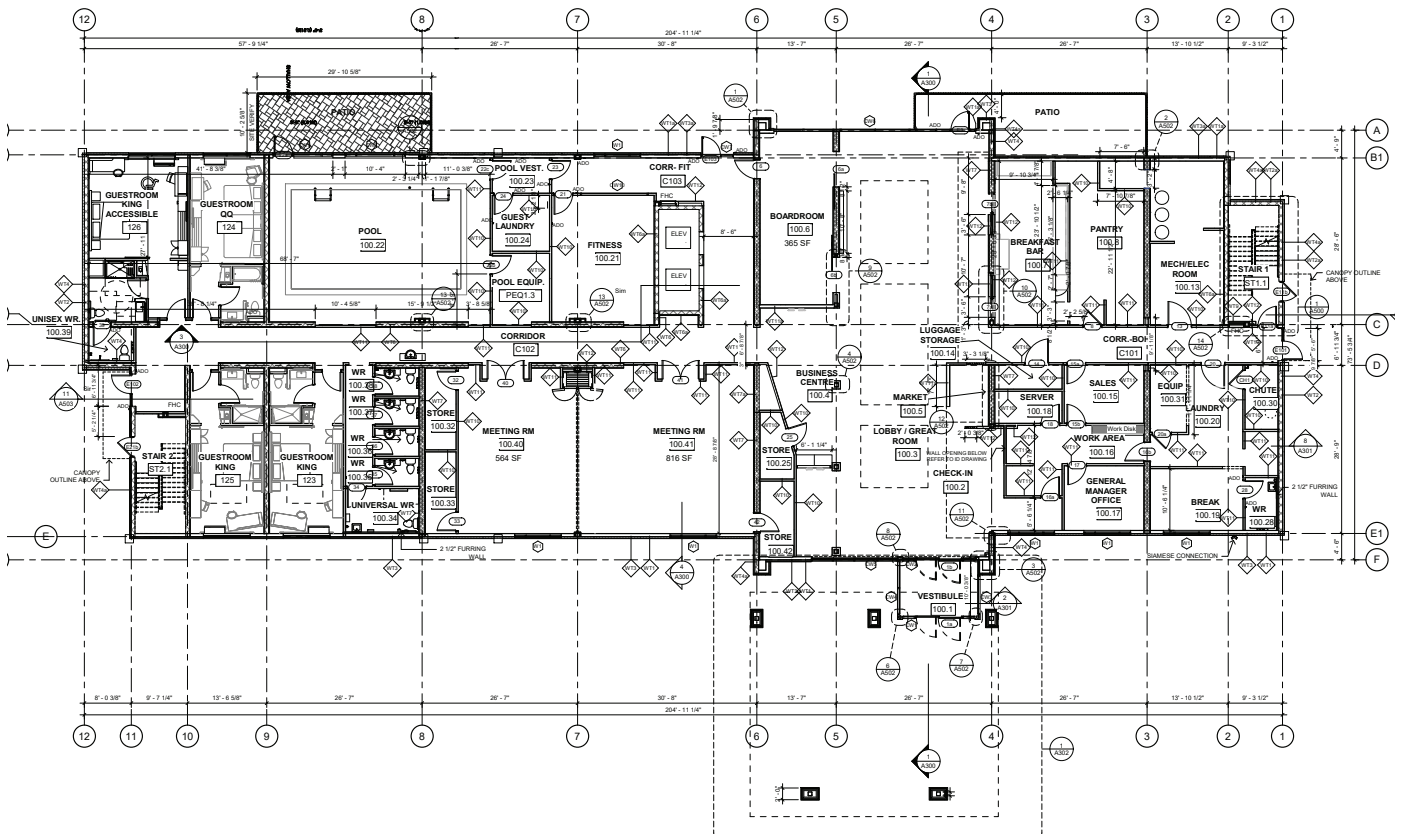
Proposed ground floor plan. Courtesy of Chamberlain Architectural Services
